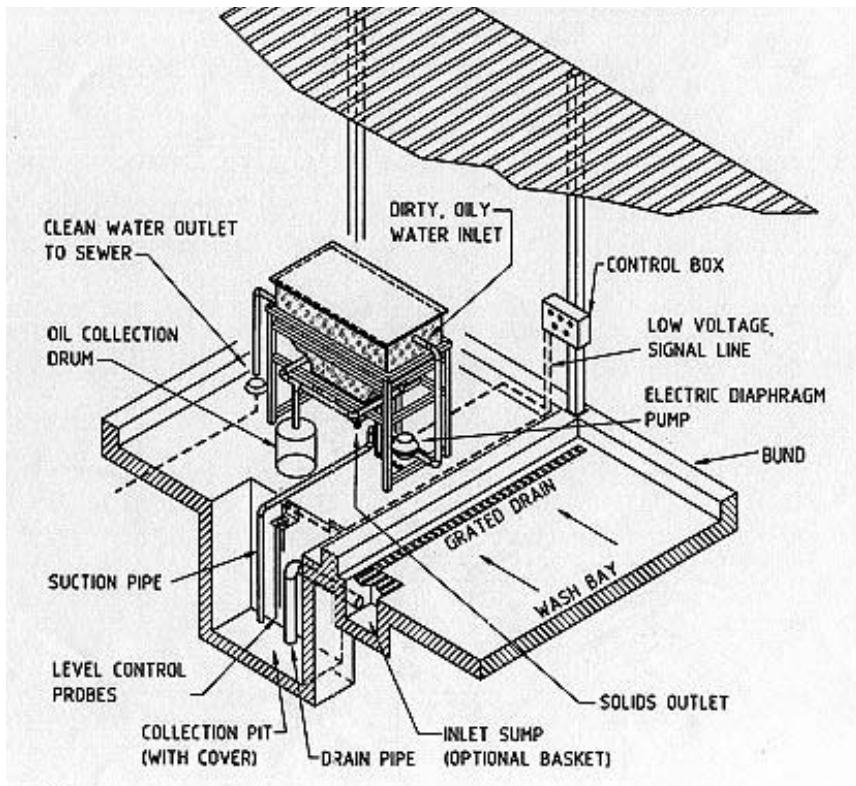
Typical Coalescing Plate Separator system, general arrangement drawing.
